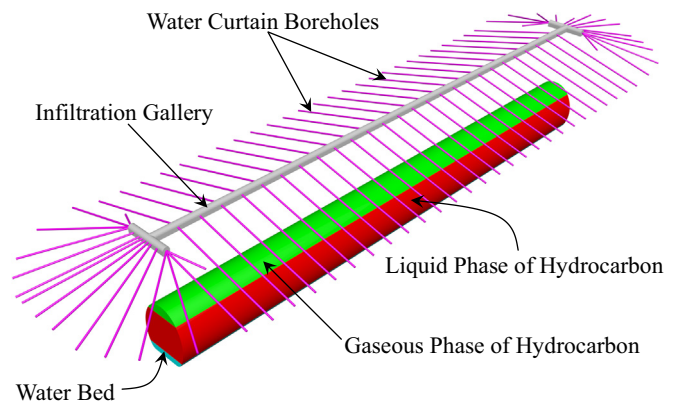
Installation and components of water curtain around an unlined storage cavern.
